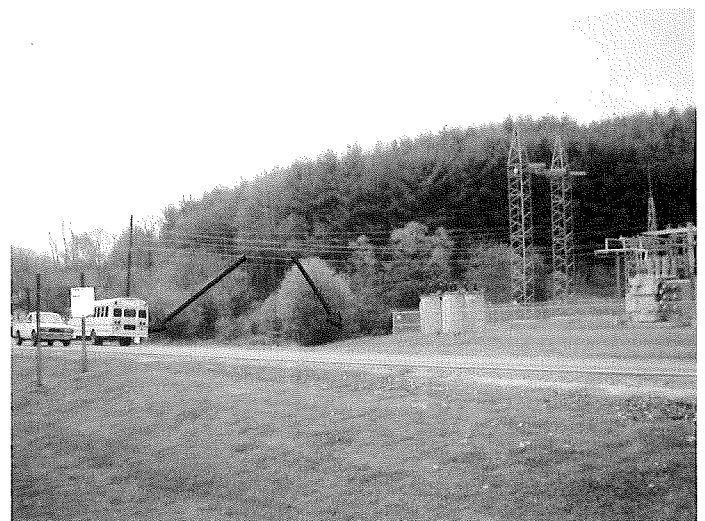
Looking west along some of the proposed drainage piping area within the western portion of the area.
